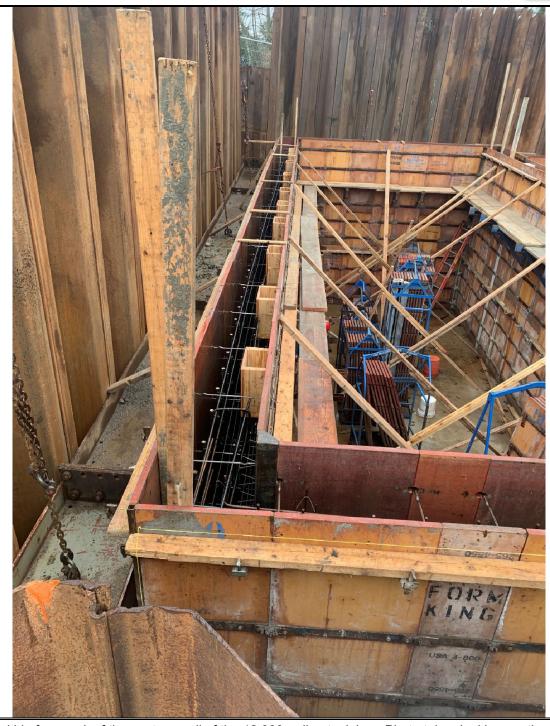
Rebar within formwork of the eastern wall of the 12,000-gallon tank bay. Photo taken looking south.
